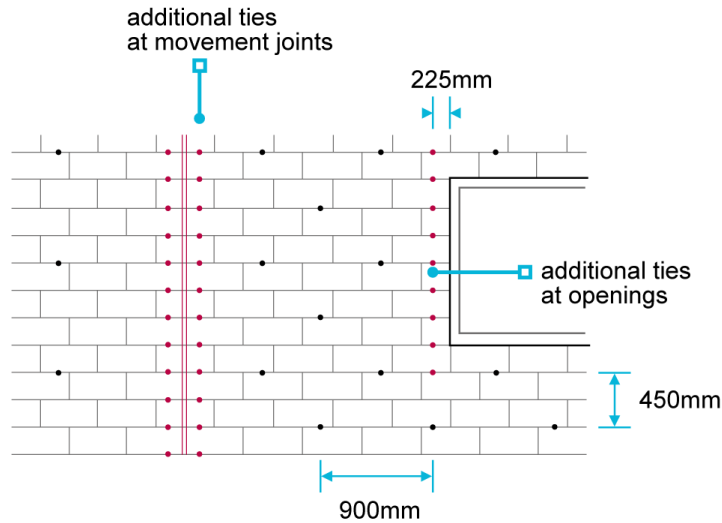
Typical Wall tie detail (Ref NHBC Standard 6.1.18)
